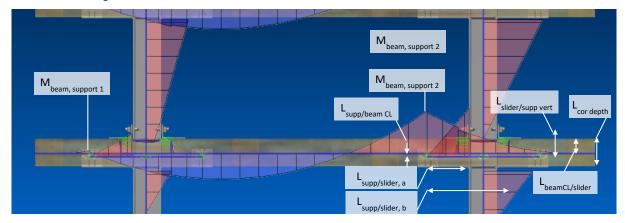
Bending moment after joint uplift (sway to right) overlaid on drawing of 1:5 scale test building
